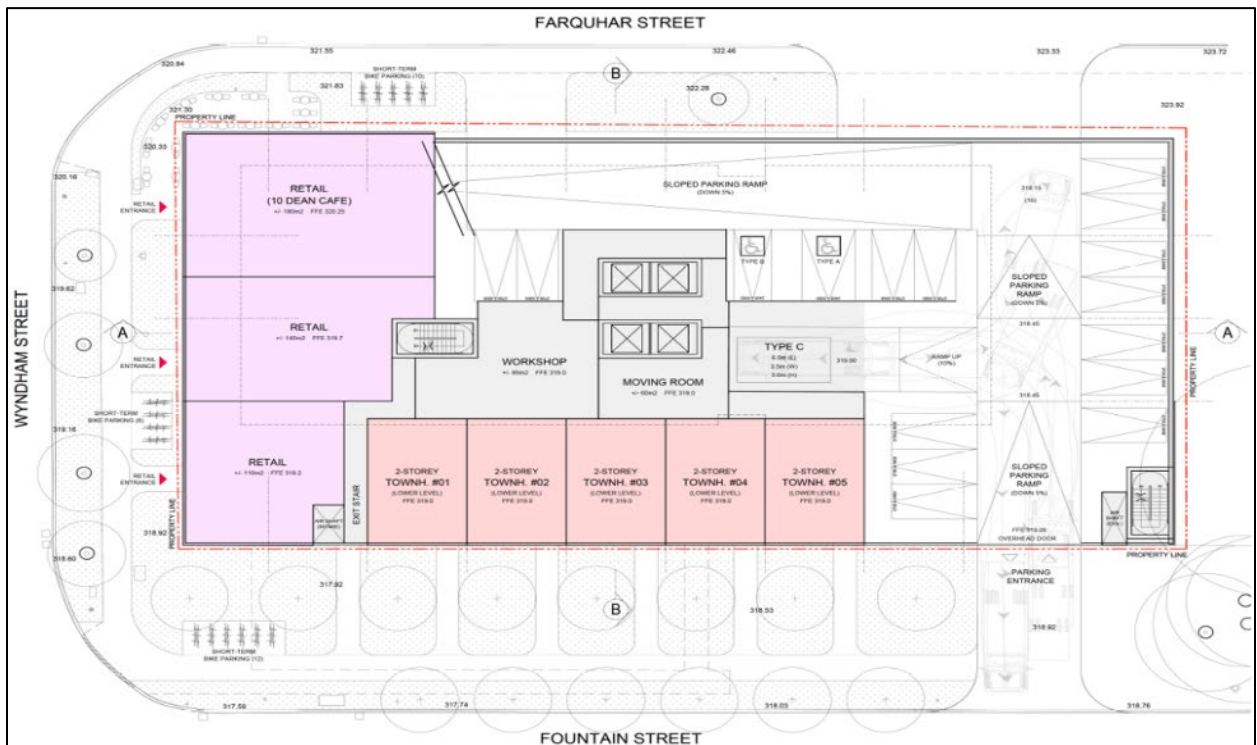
Lower Ground Floor Plan (Source: Hariri Pontarini Architects)
